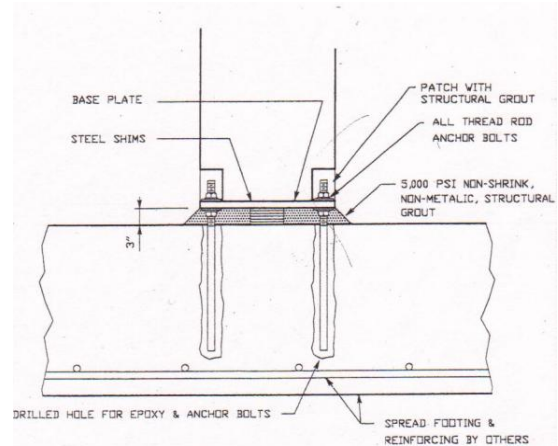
Column to Spread Footing Connection (image provided by Nitterhouse Concrete Products)
